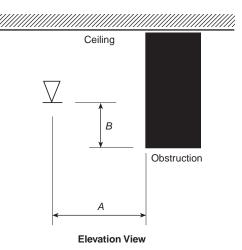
Positioning of Sprinkler to Avoid Obstruction to Discharge (Residential Upright and Pendent Spray Sprinklers).
